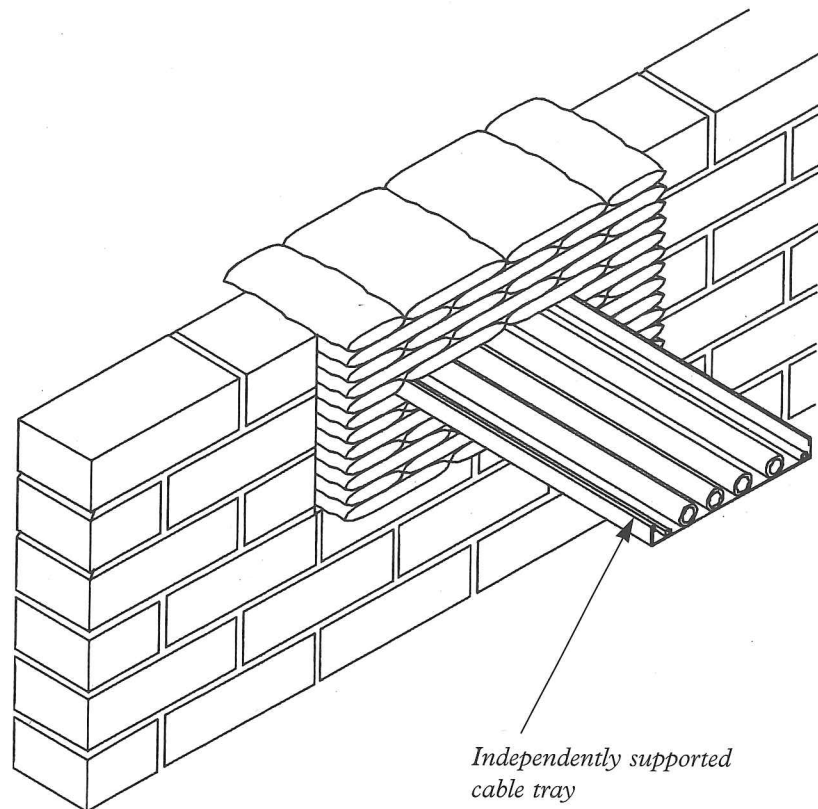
Intumescent pillows used as temporary fire stopping around a cable tray arrangement
